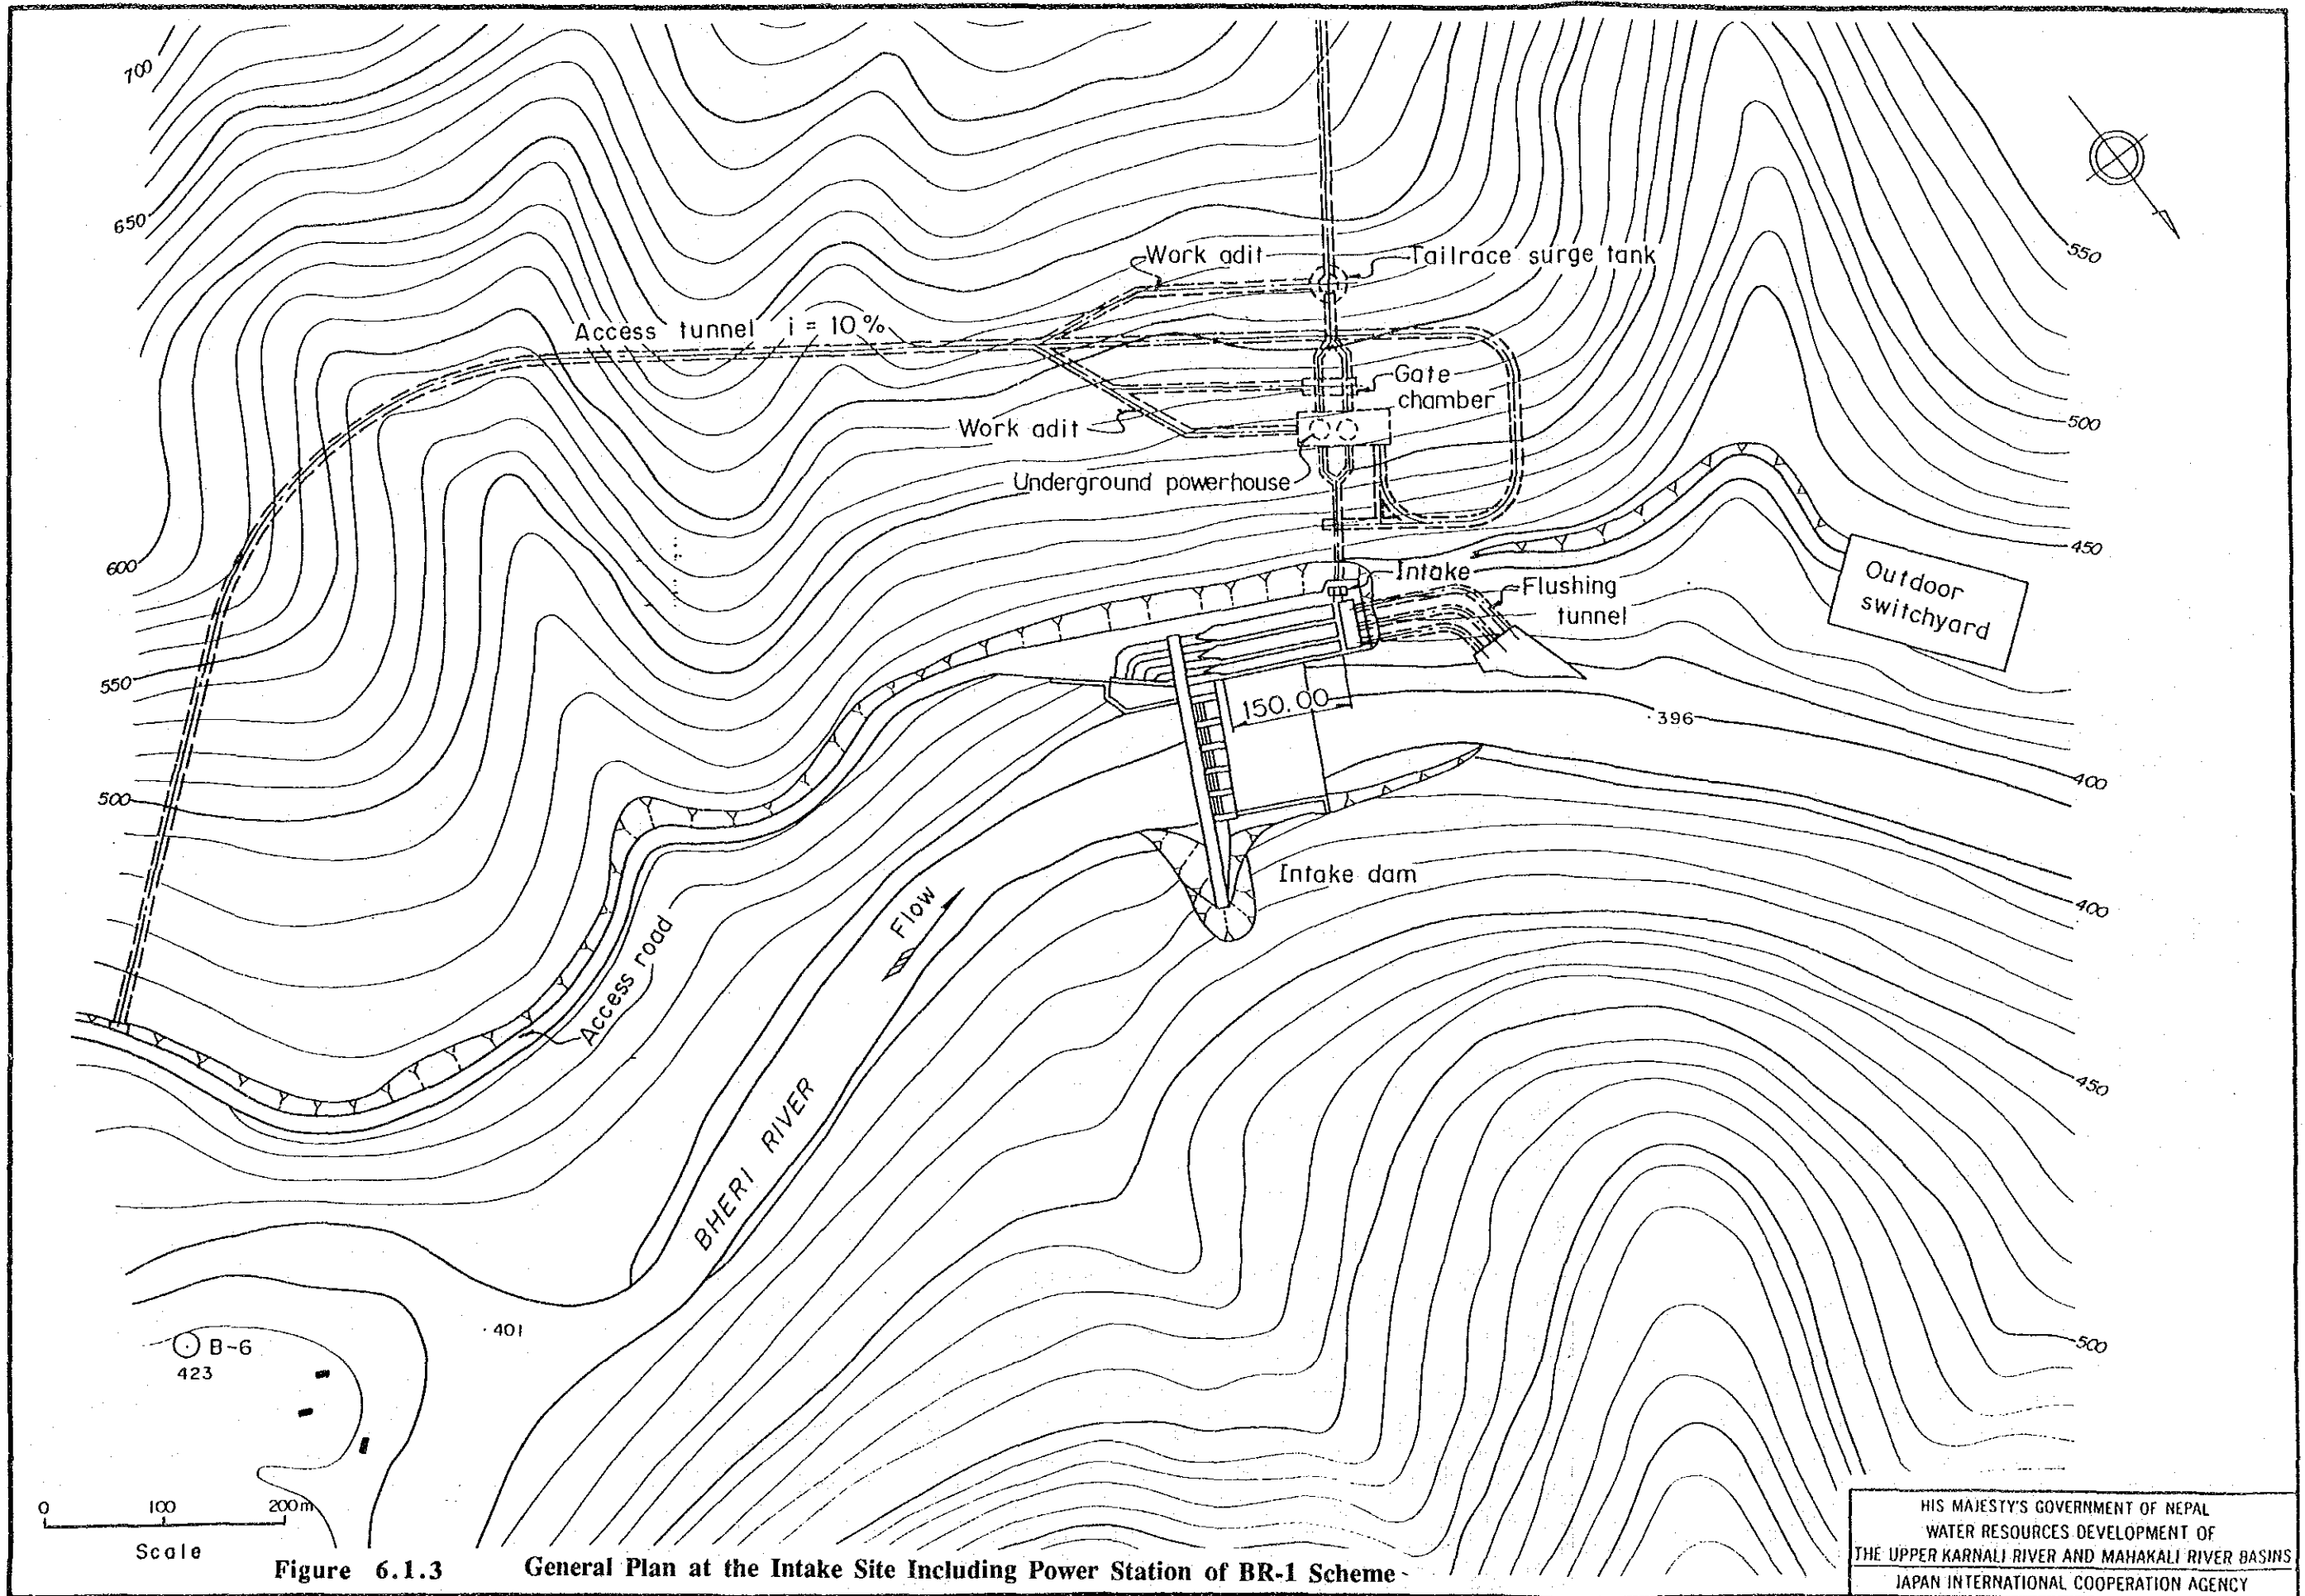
General Plan at the Intake Site Including Power Station of BR-1 Scheme
